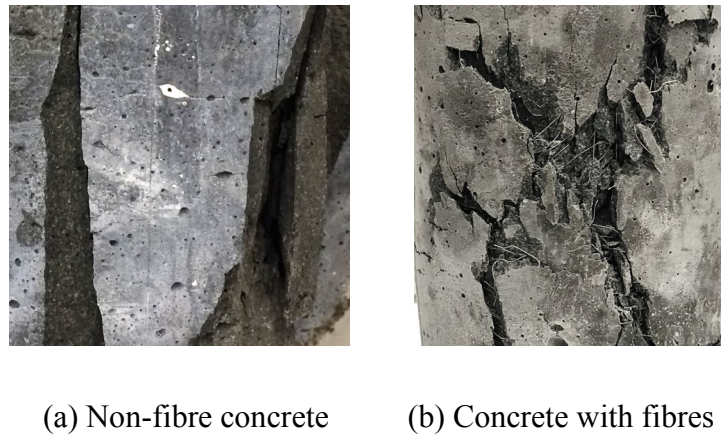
Cracks on concrete cylinders with and without steel fibres
